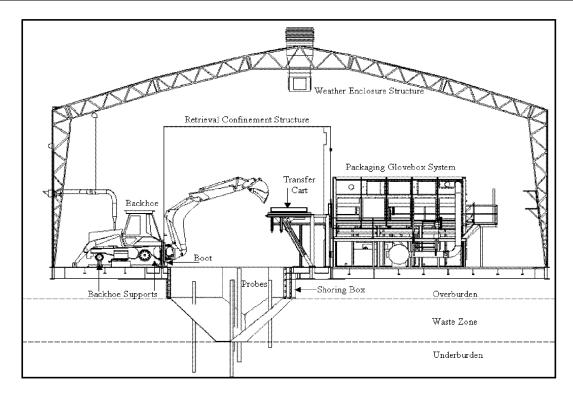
Cross section of the OU 7-10 Glovebox Excavator Method Project facility.
